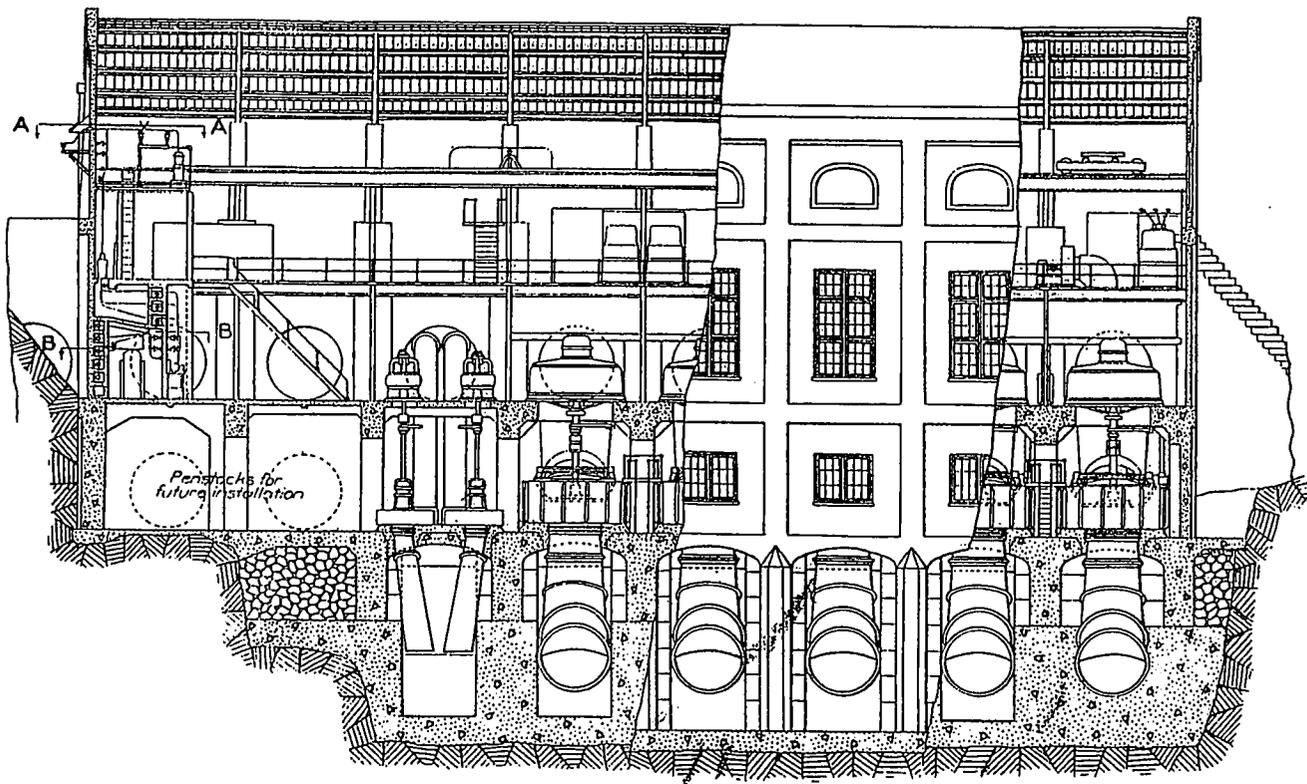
Longitudinal section of Minidoka Powerplant, from U.S. Reclamation Service, 1909.
